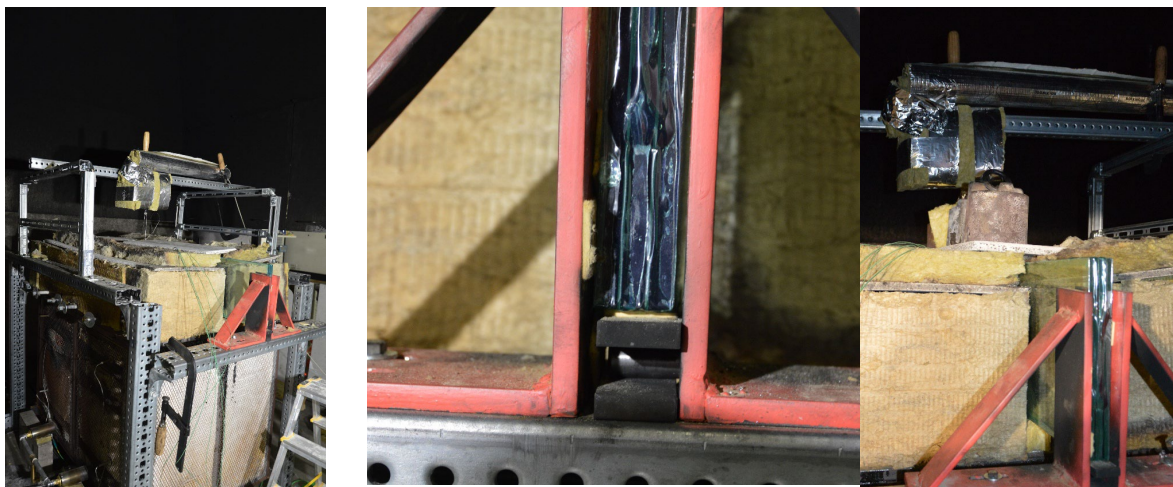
Set up of the experiment, detail of sample support, load placement.
